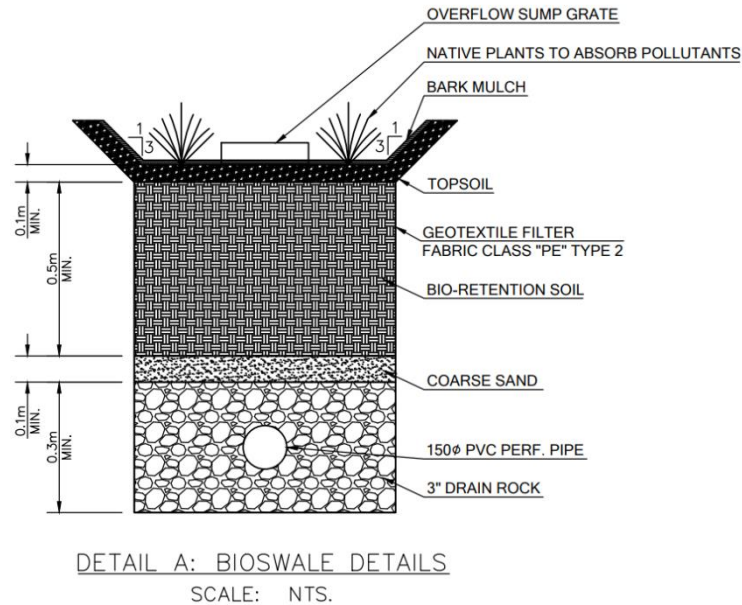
Infiltration Soil with Reservoir and Subdrain Cross Section
